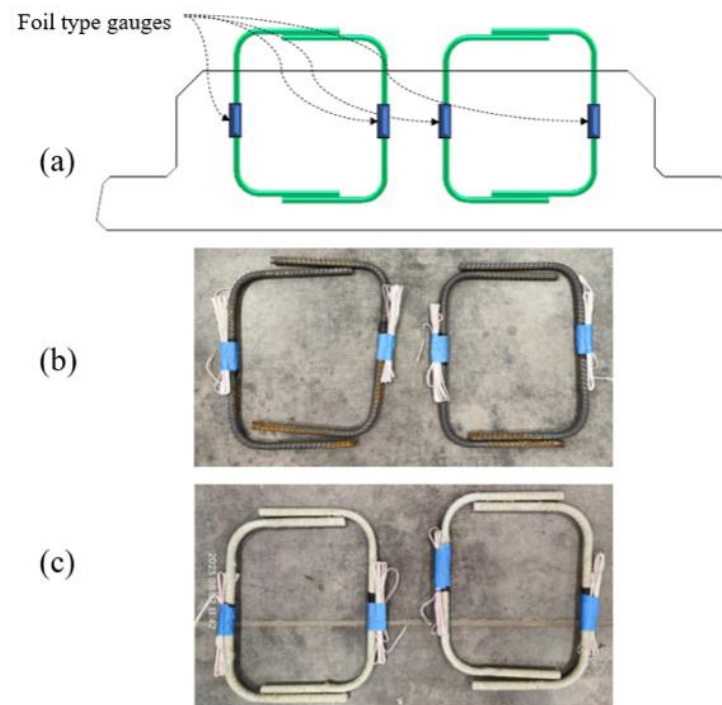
Strain gauges installed on 4K rebar pairs: (a) Instrumentation plan, (b) Carbon steel, and (c) GFRP
